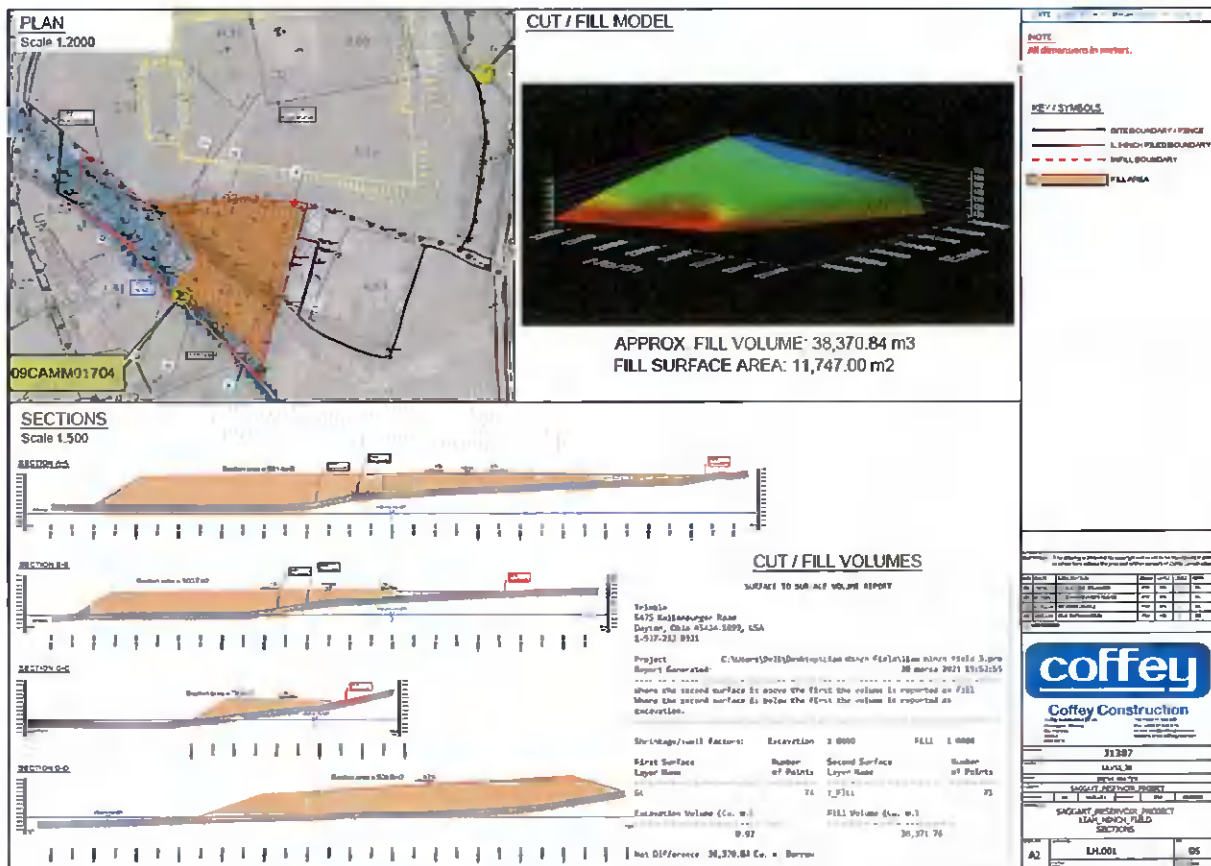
Extracts from proposed infill area and cross sections of the site (Refer to Planning drawing LH.001)
